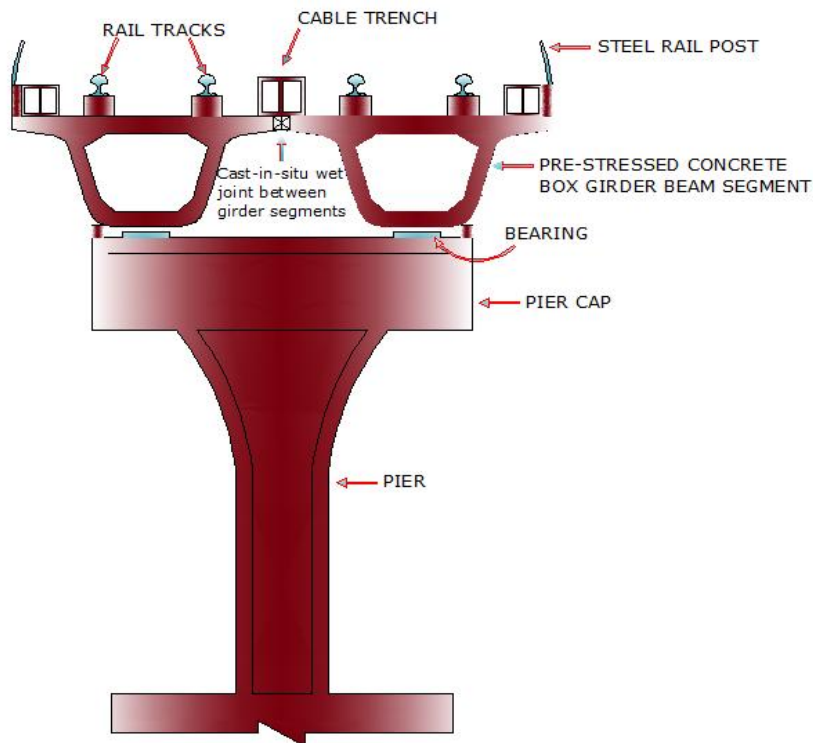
Typical cross-section of Two Single Cell Connected with Epoxy Joint (cast-in-situ wet joint), AA-LRT's Elevated structure
